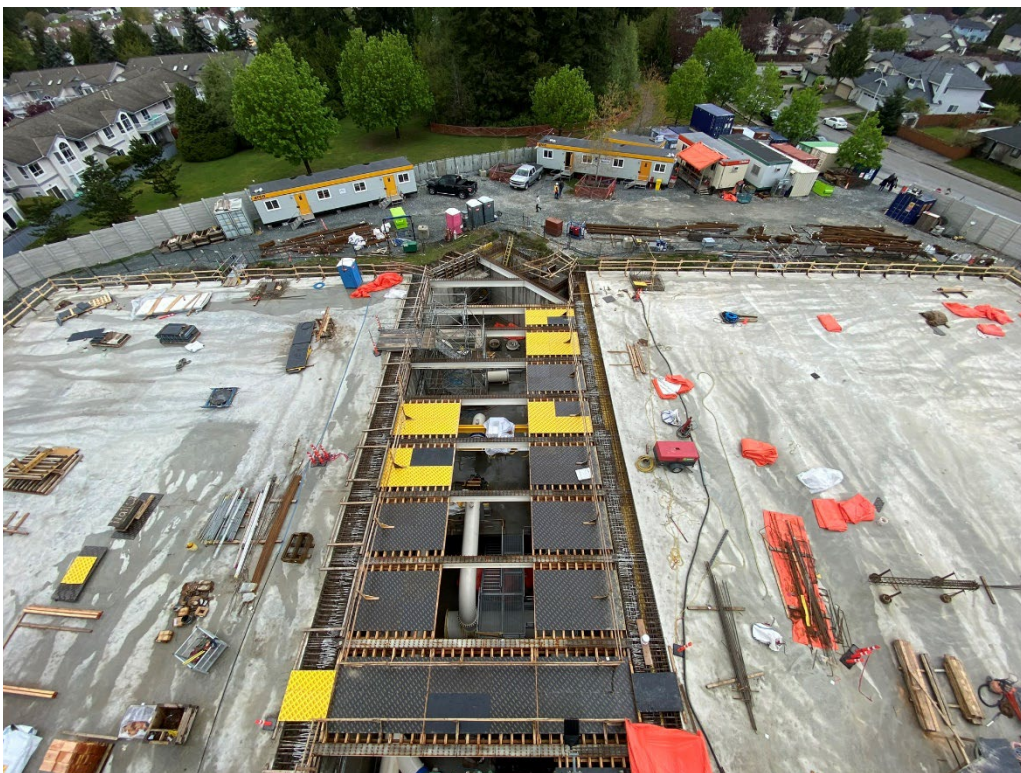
Overhead View of Reservoir Cell Construction within the Park
